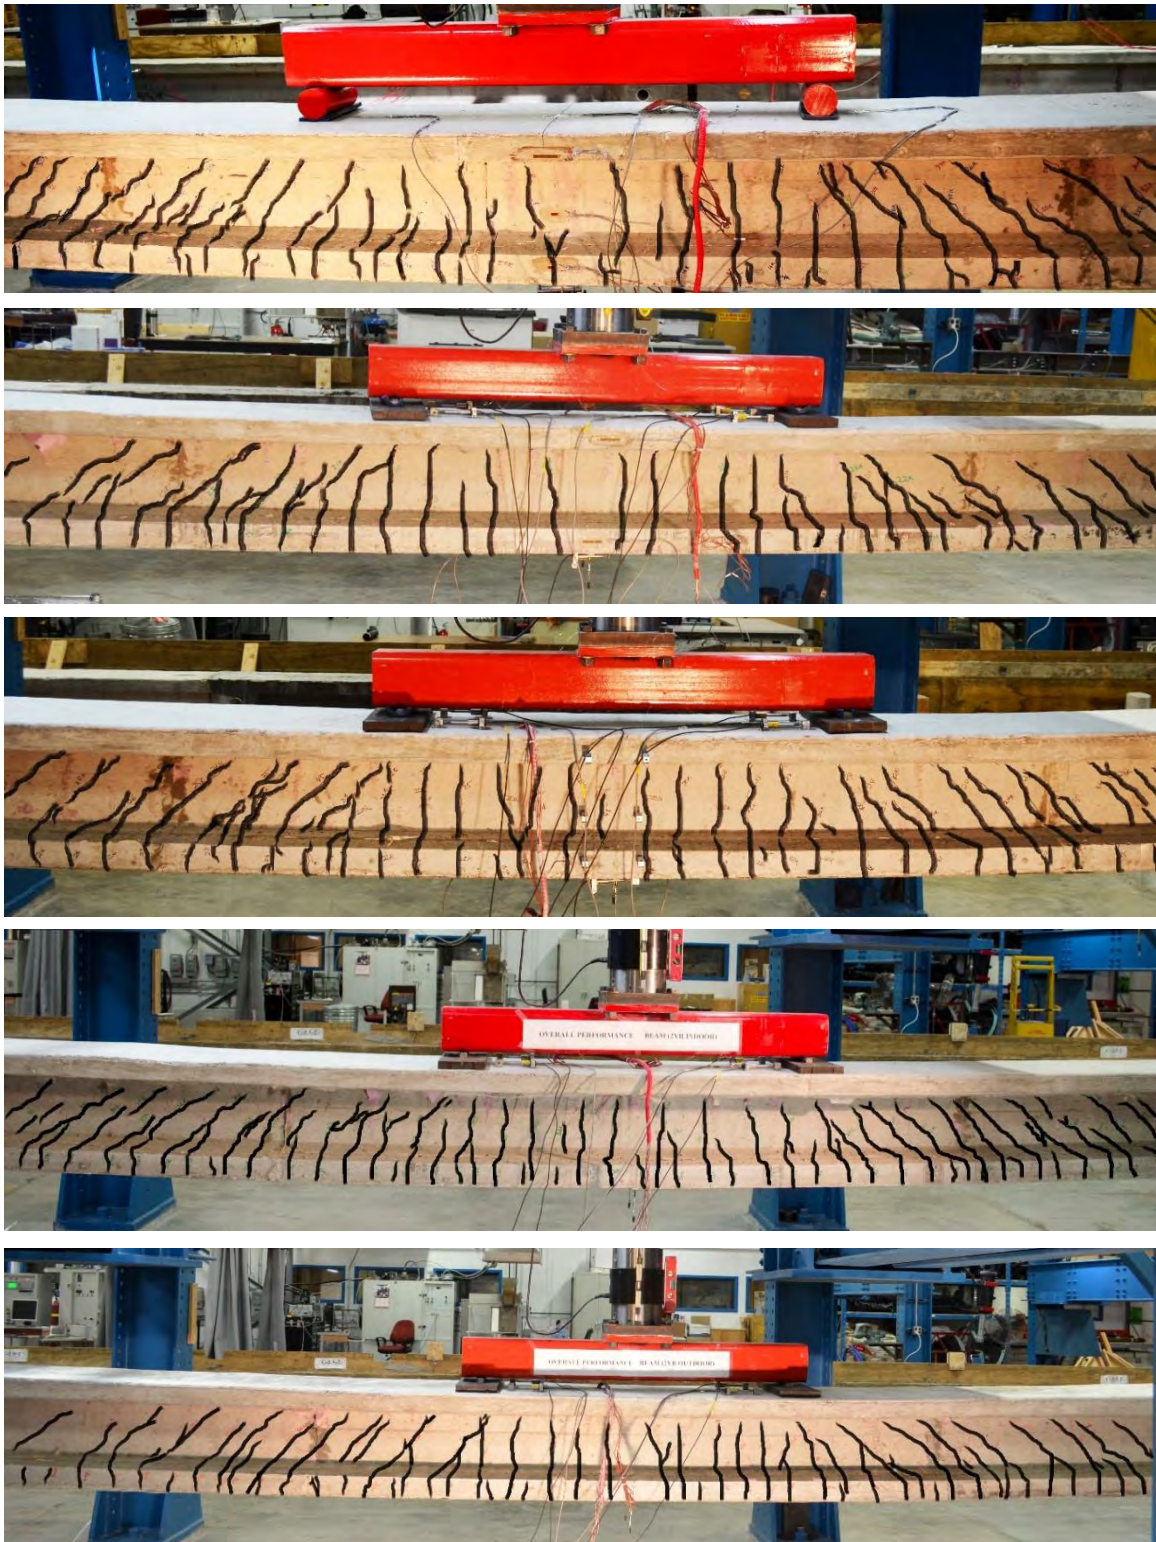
Cracking pattern of decked bulb T beams from the top: C, I-1, O-1, I-2, and O-2
